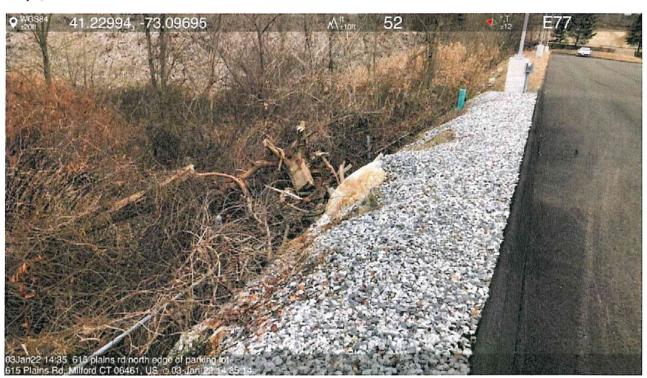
facing east fill over boulder / block retaining wall with gavel and loose soil.
